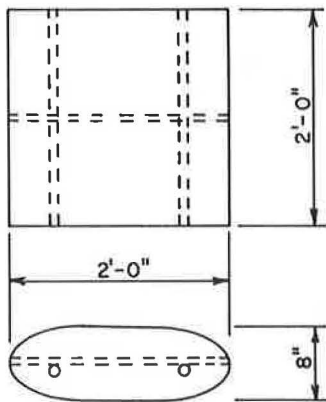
Type F cast-in-place cellular concrete revetment.
